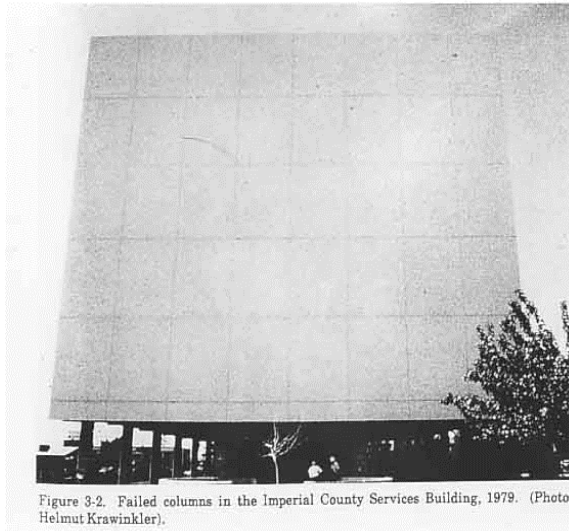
Failed columns in the Imperial County Services Building, 1979. (Photo: Helmut Krawinkler).
